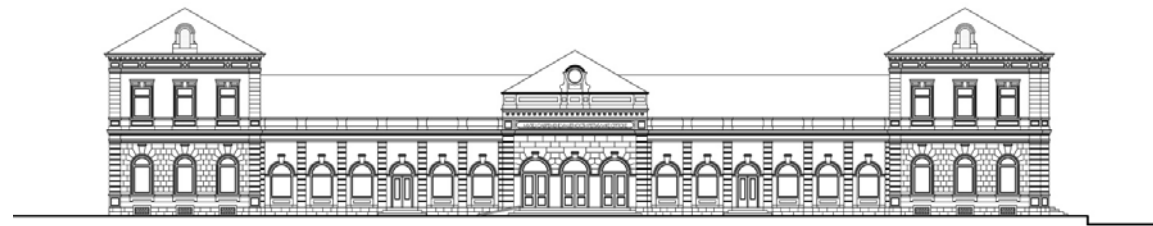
Railway station "Banja Luka City"; elevation view from west.
